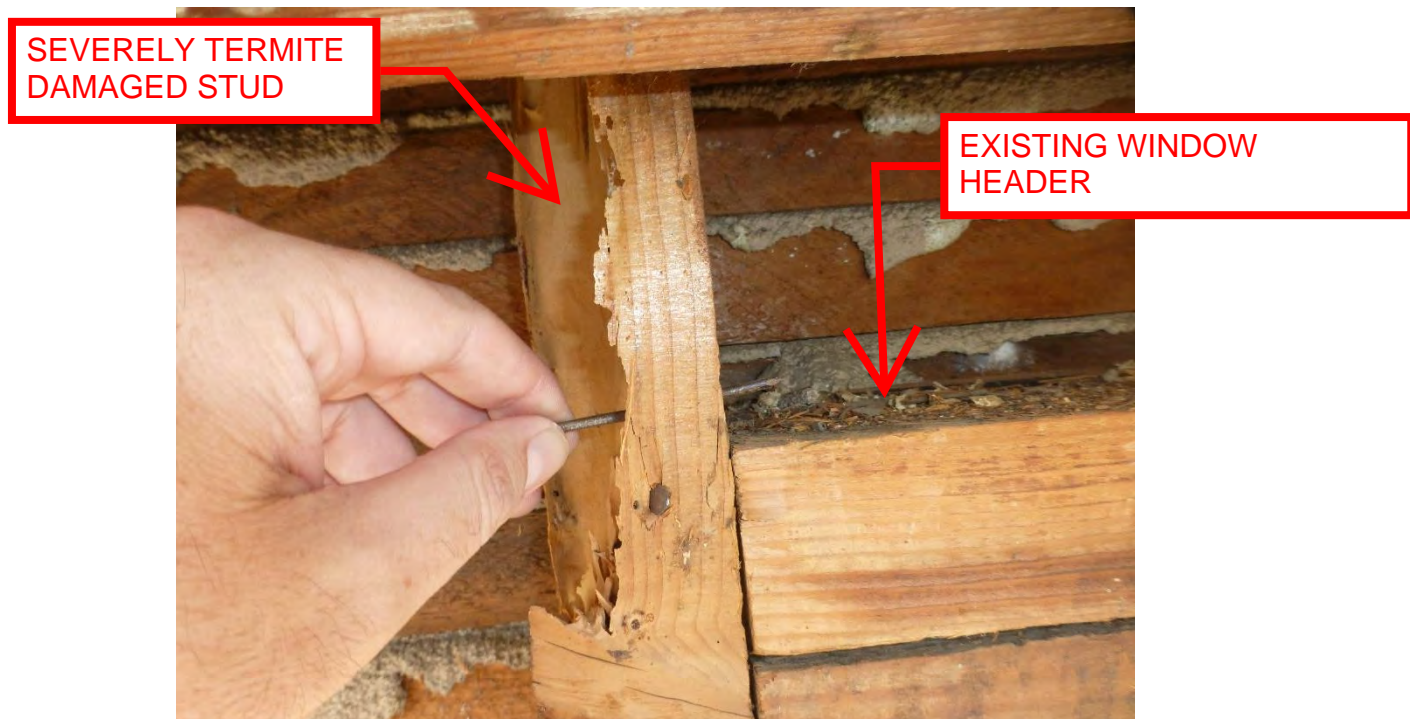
EAST ELEVATION – DAMAGED STUD
